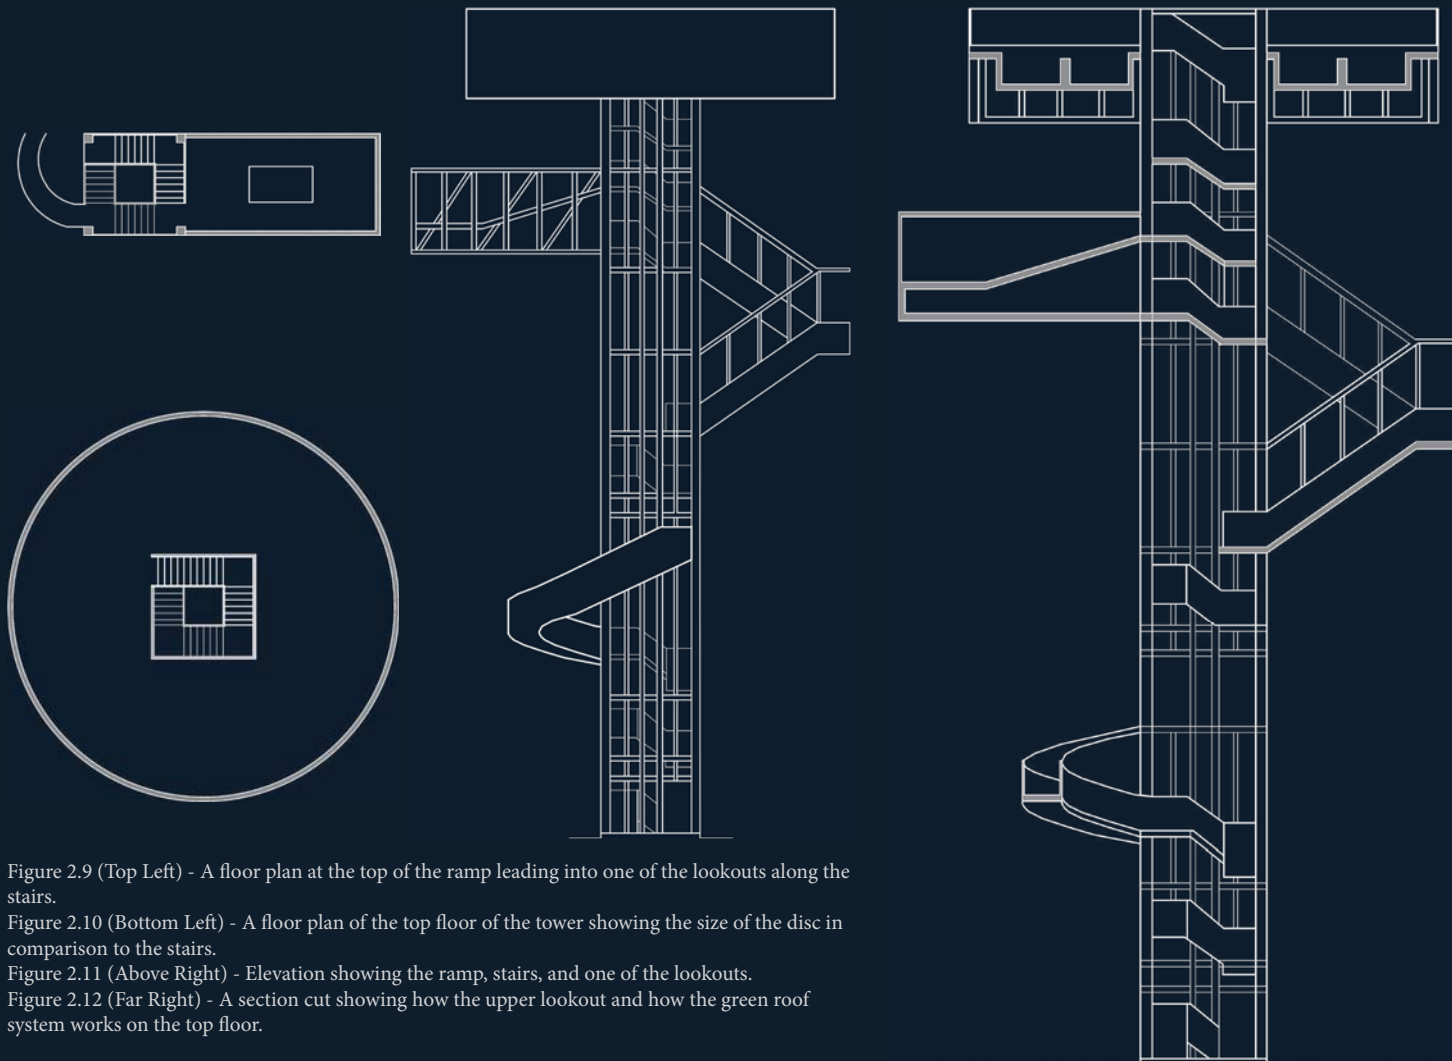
(Top Left) - A floor plan at the top of the ramp leading into one of the lookouts along the stairs.
